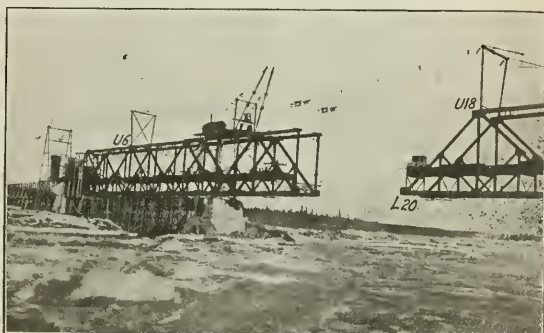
Northern Anchor-span Erected, Also 100 Feet of Adjacent Cantilever. Note Additional Rocker-bent at U6 for Supporting Cables
